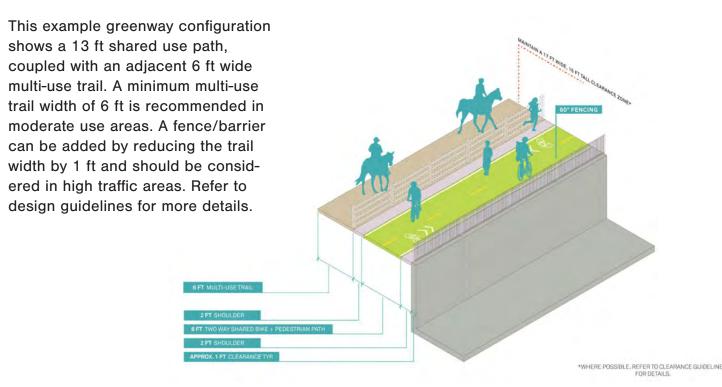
19-ft wide greenway cross section Option B example from Table 5-1
